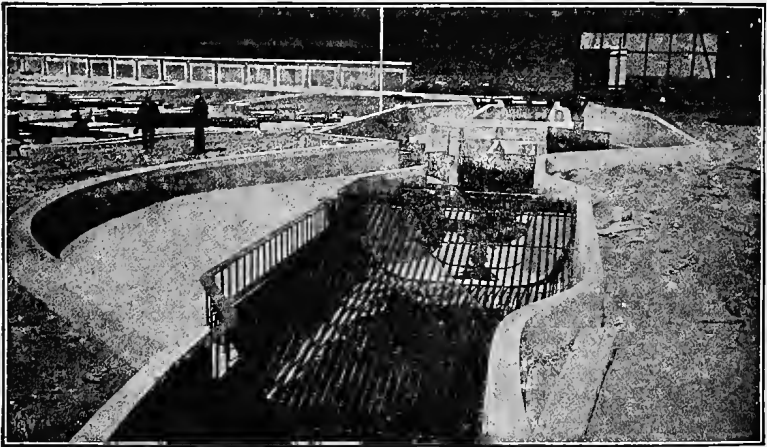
Waste-weir at rack of Emschergerossenschaft plant.
